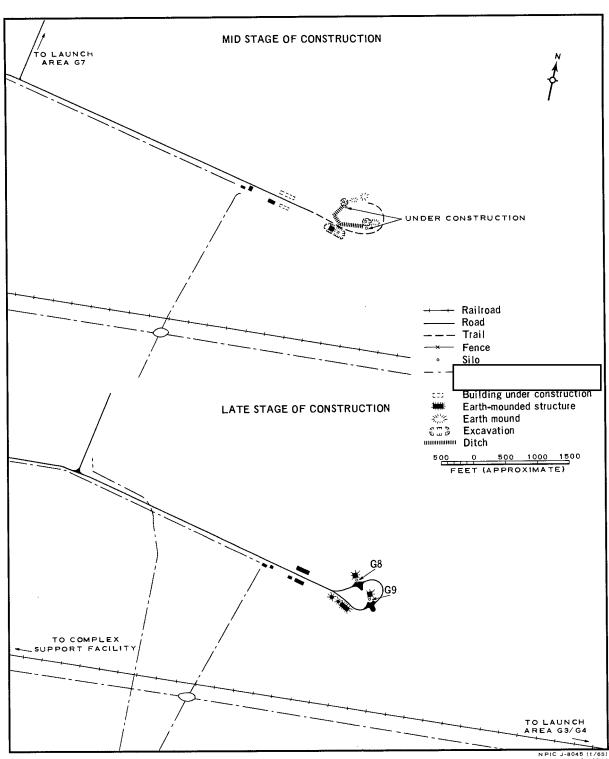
LAYOUT OF LAUNCH SITE G8/G9(19), TYURATA M, IN MID (TOP) AND LATE (BOTTOM) STAGES OF CONSTRUCTION.
